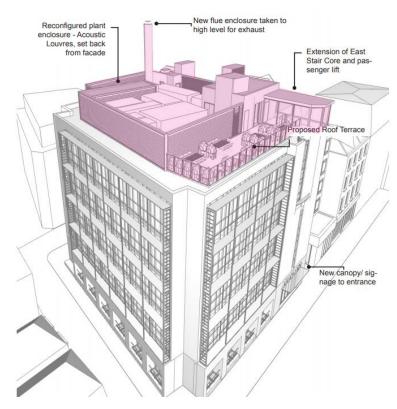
Proposed 3D concept model of scheme (source BMJ Architects, 2021)
